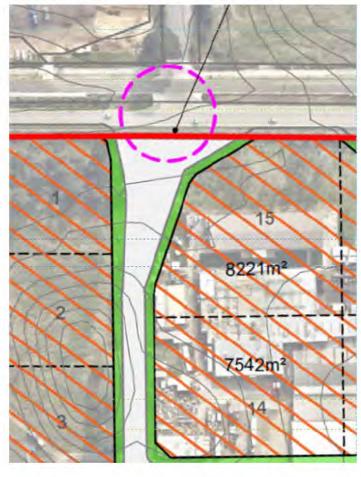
Extract from Indicative Concept Plan for 1500 Thompsons Road (Source: Beveridge Williams, full plan Appendix A)
